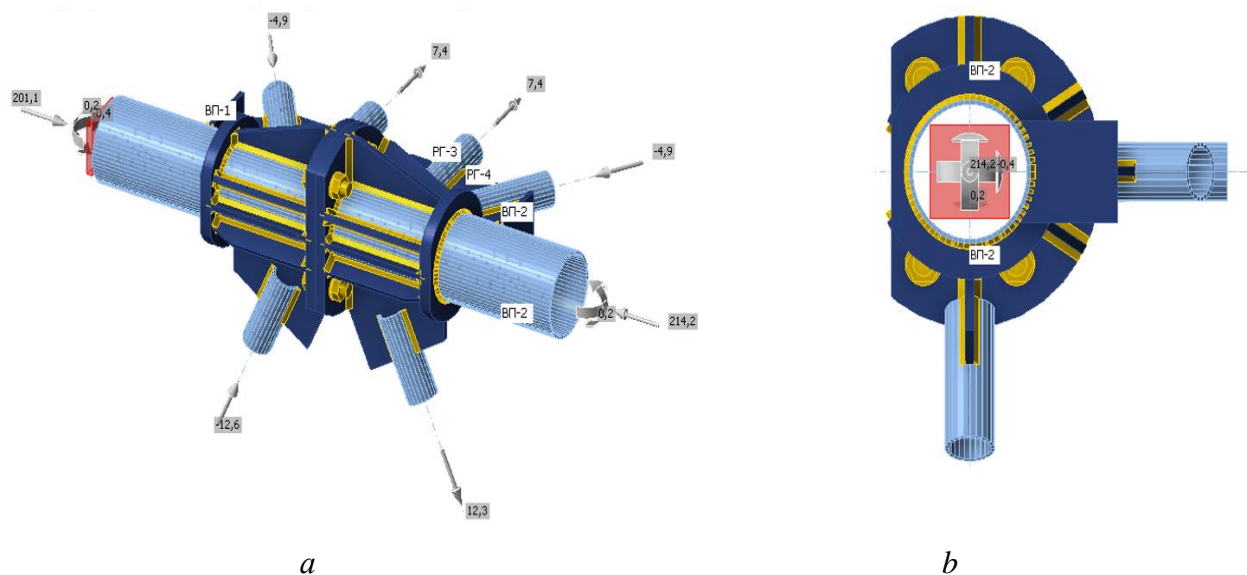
General view of Model 4 of the analysed joint with bolted connection and welds (a). Cross-section of the flange connection (b).
